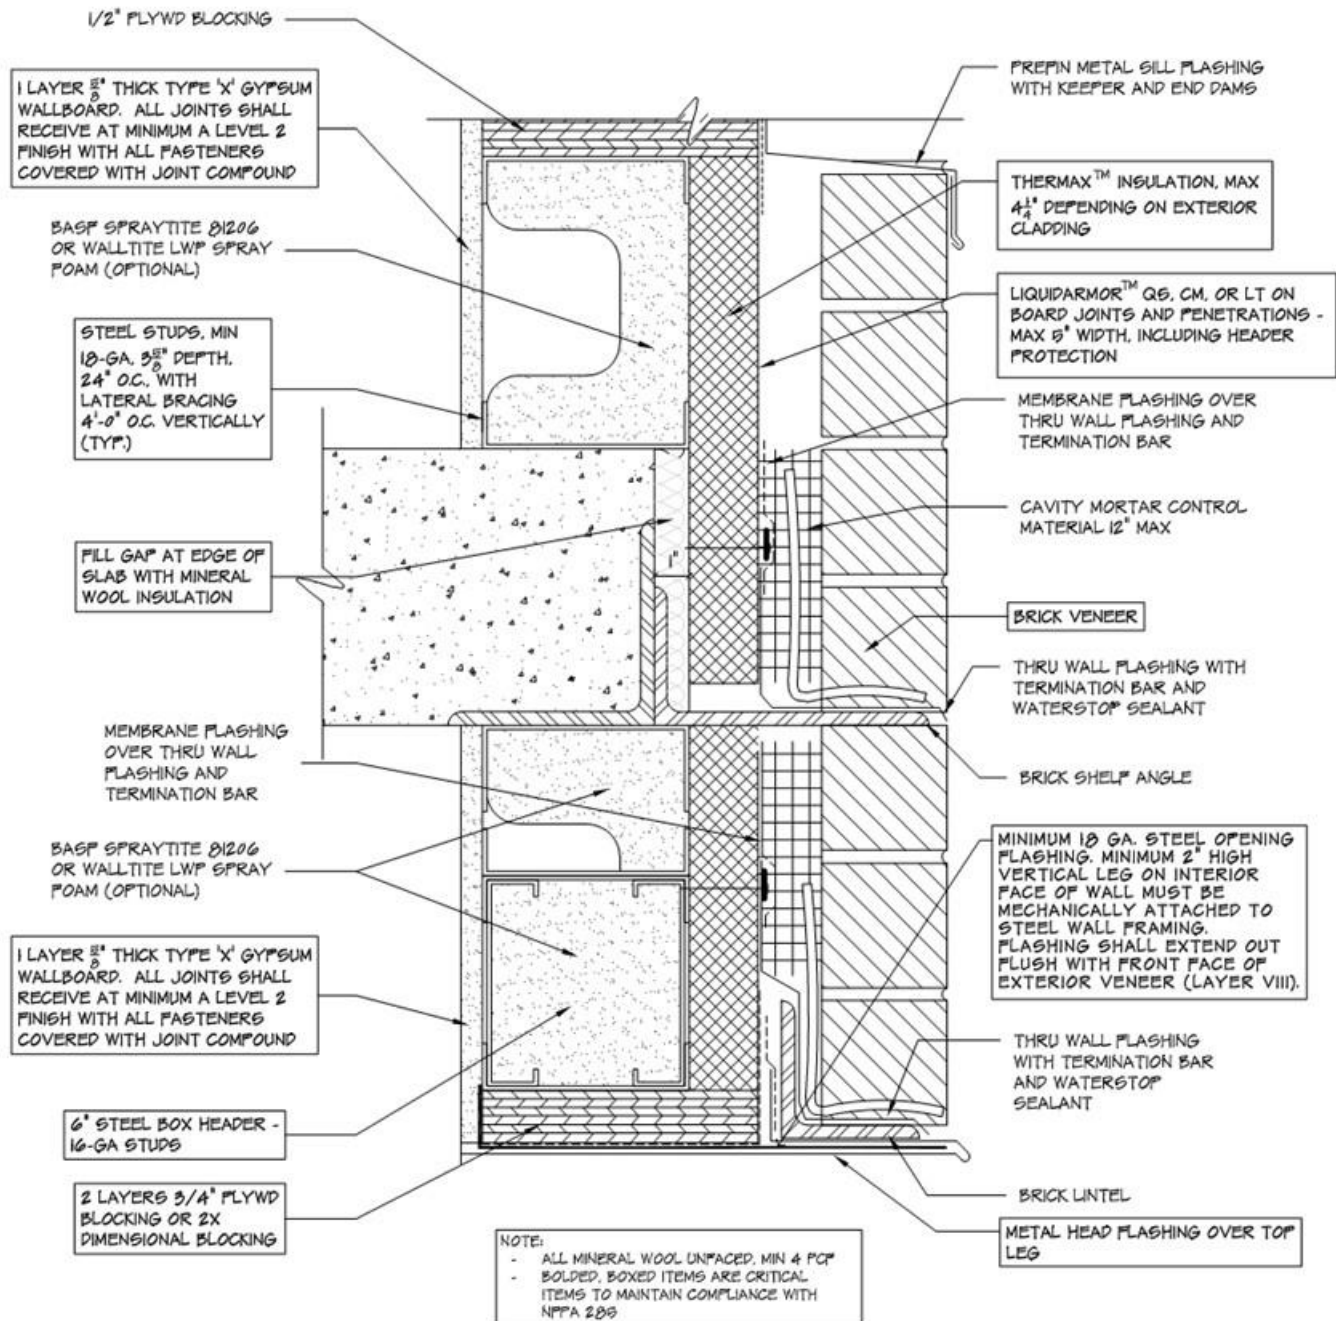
Required Opening Head Protection When BASF SPRAYTITE® 81206 or Walltite LWP Spray Foam Is Used in the Cavity (Infill Wall Construction with Brick Façade)
